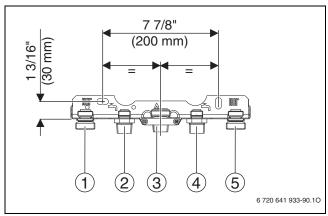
Hydraulics connection plate for combi boiler ZWB...-3A (front view)
